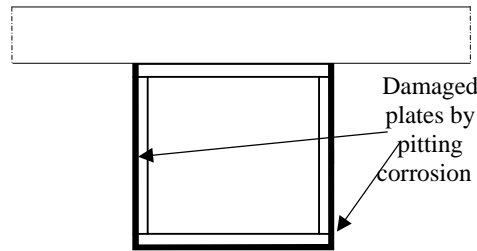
Model of Corroded Non-composite Steel Box Girder Cross-section
